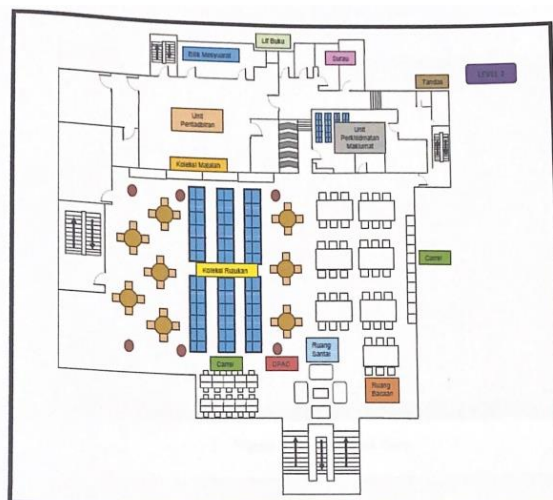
(b) Tengku Anis Library Floor Plan Level 2
